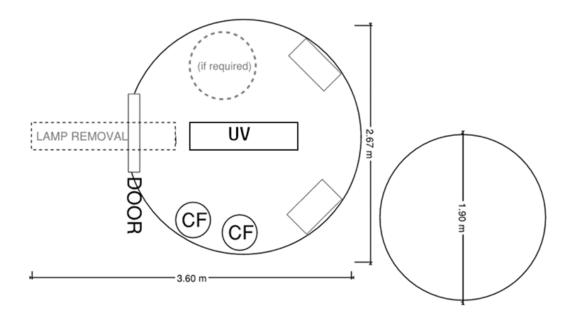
Option 1 Layout shown in a concrete Hynds Killing Shed
